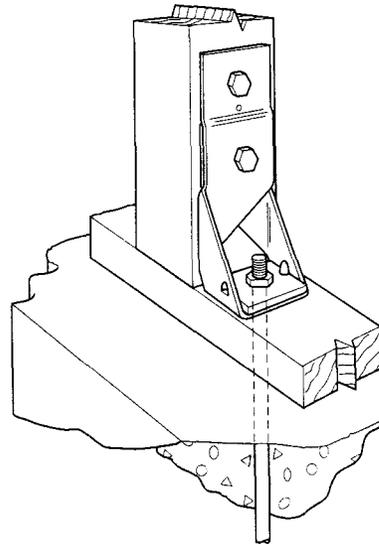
Use of steel hold-down bracket to connect a wood-frame wall with large uplift force to a footing (Simpson Strong-Tie Co., Inc.).
